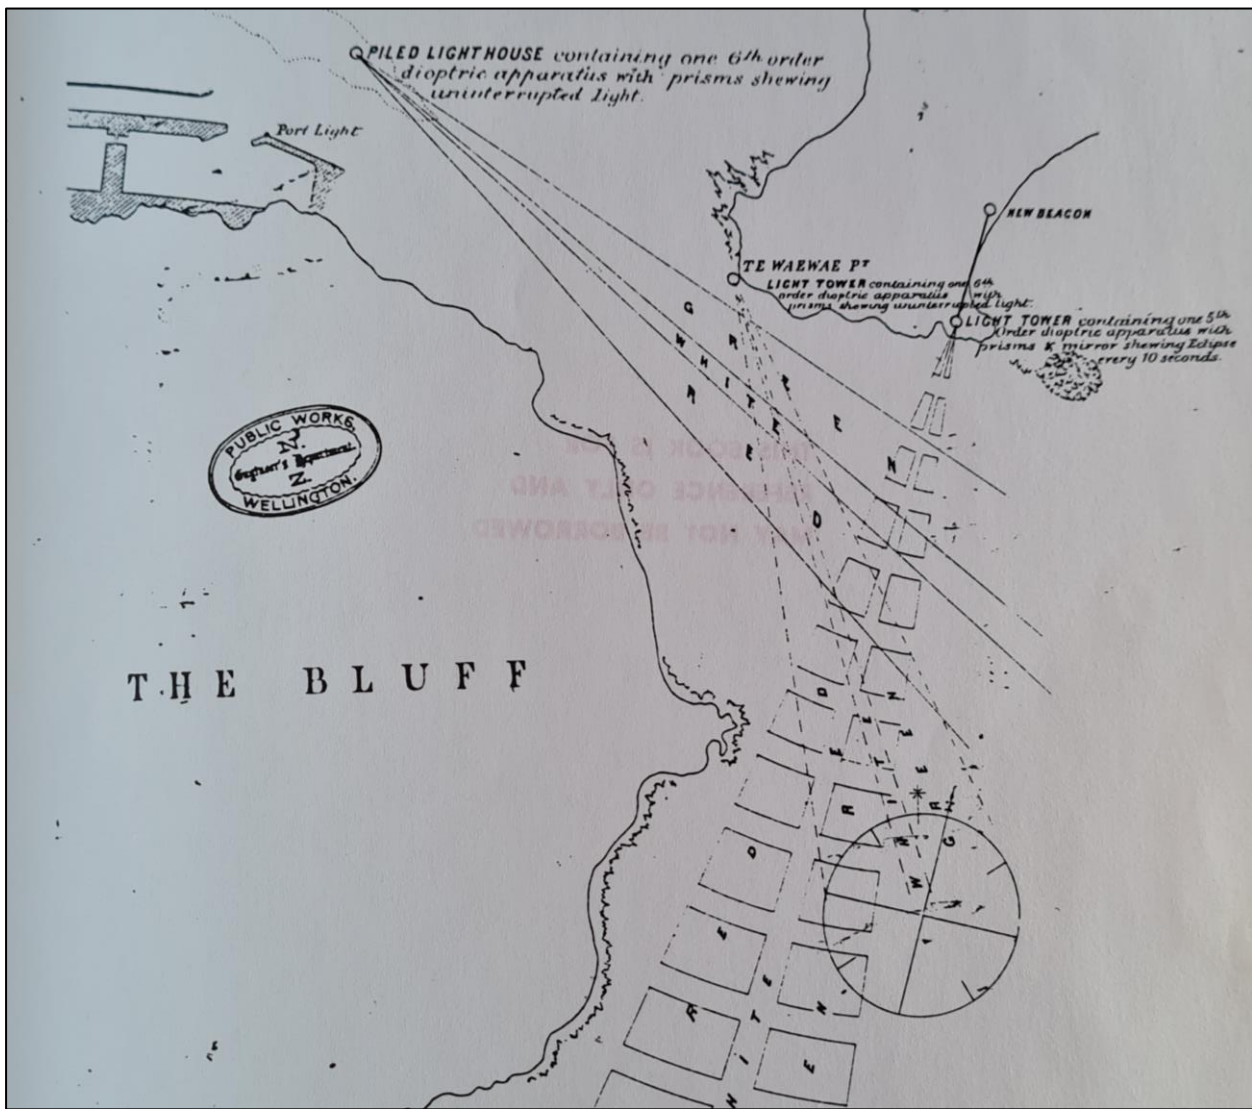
Coode's 1880 plan showing proposed light towers and beacons at Tiwai (Extract of Drawing No. 5) (Coode 1880).
